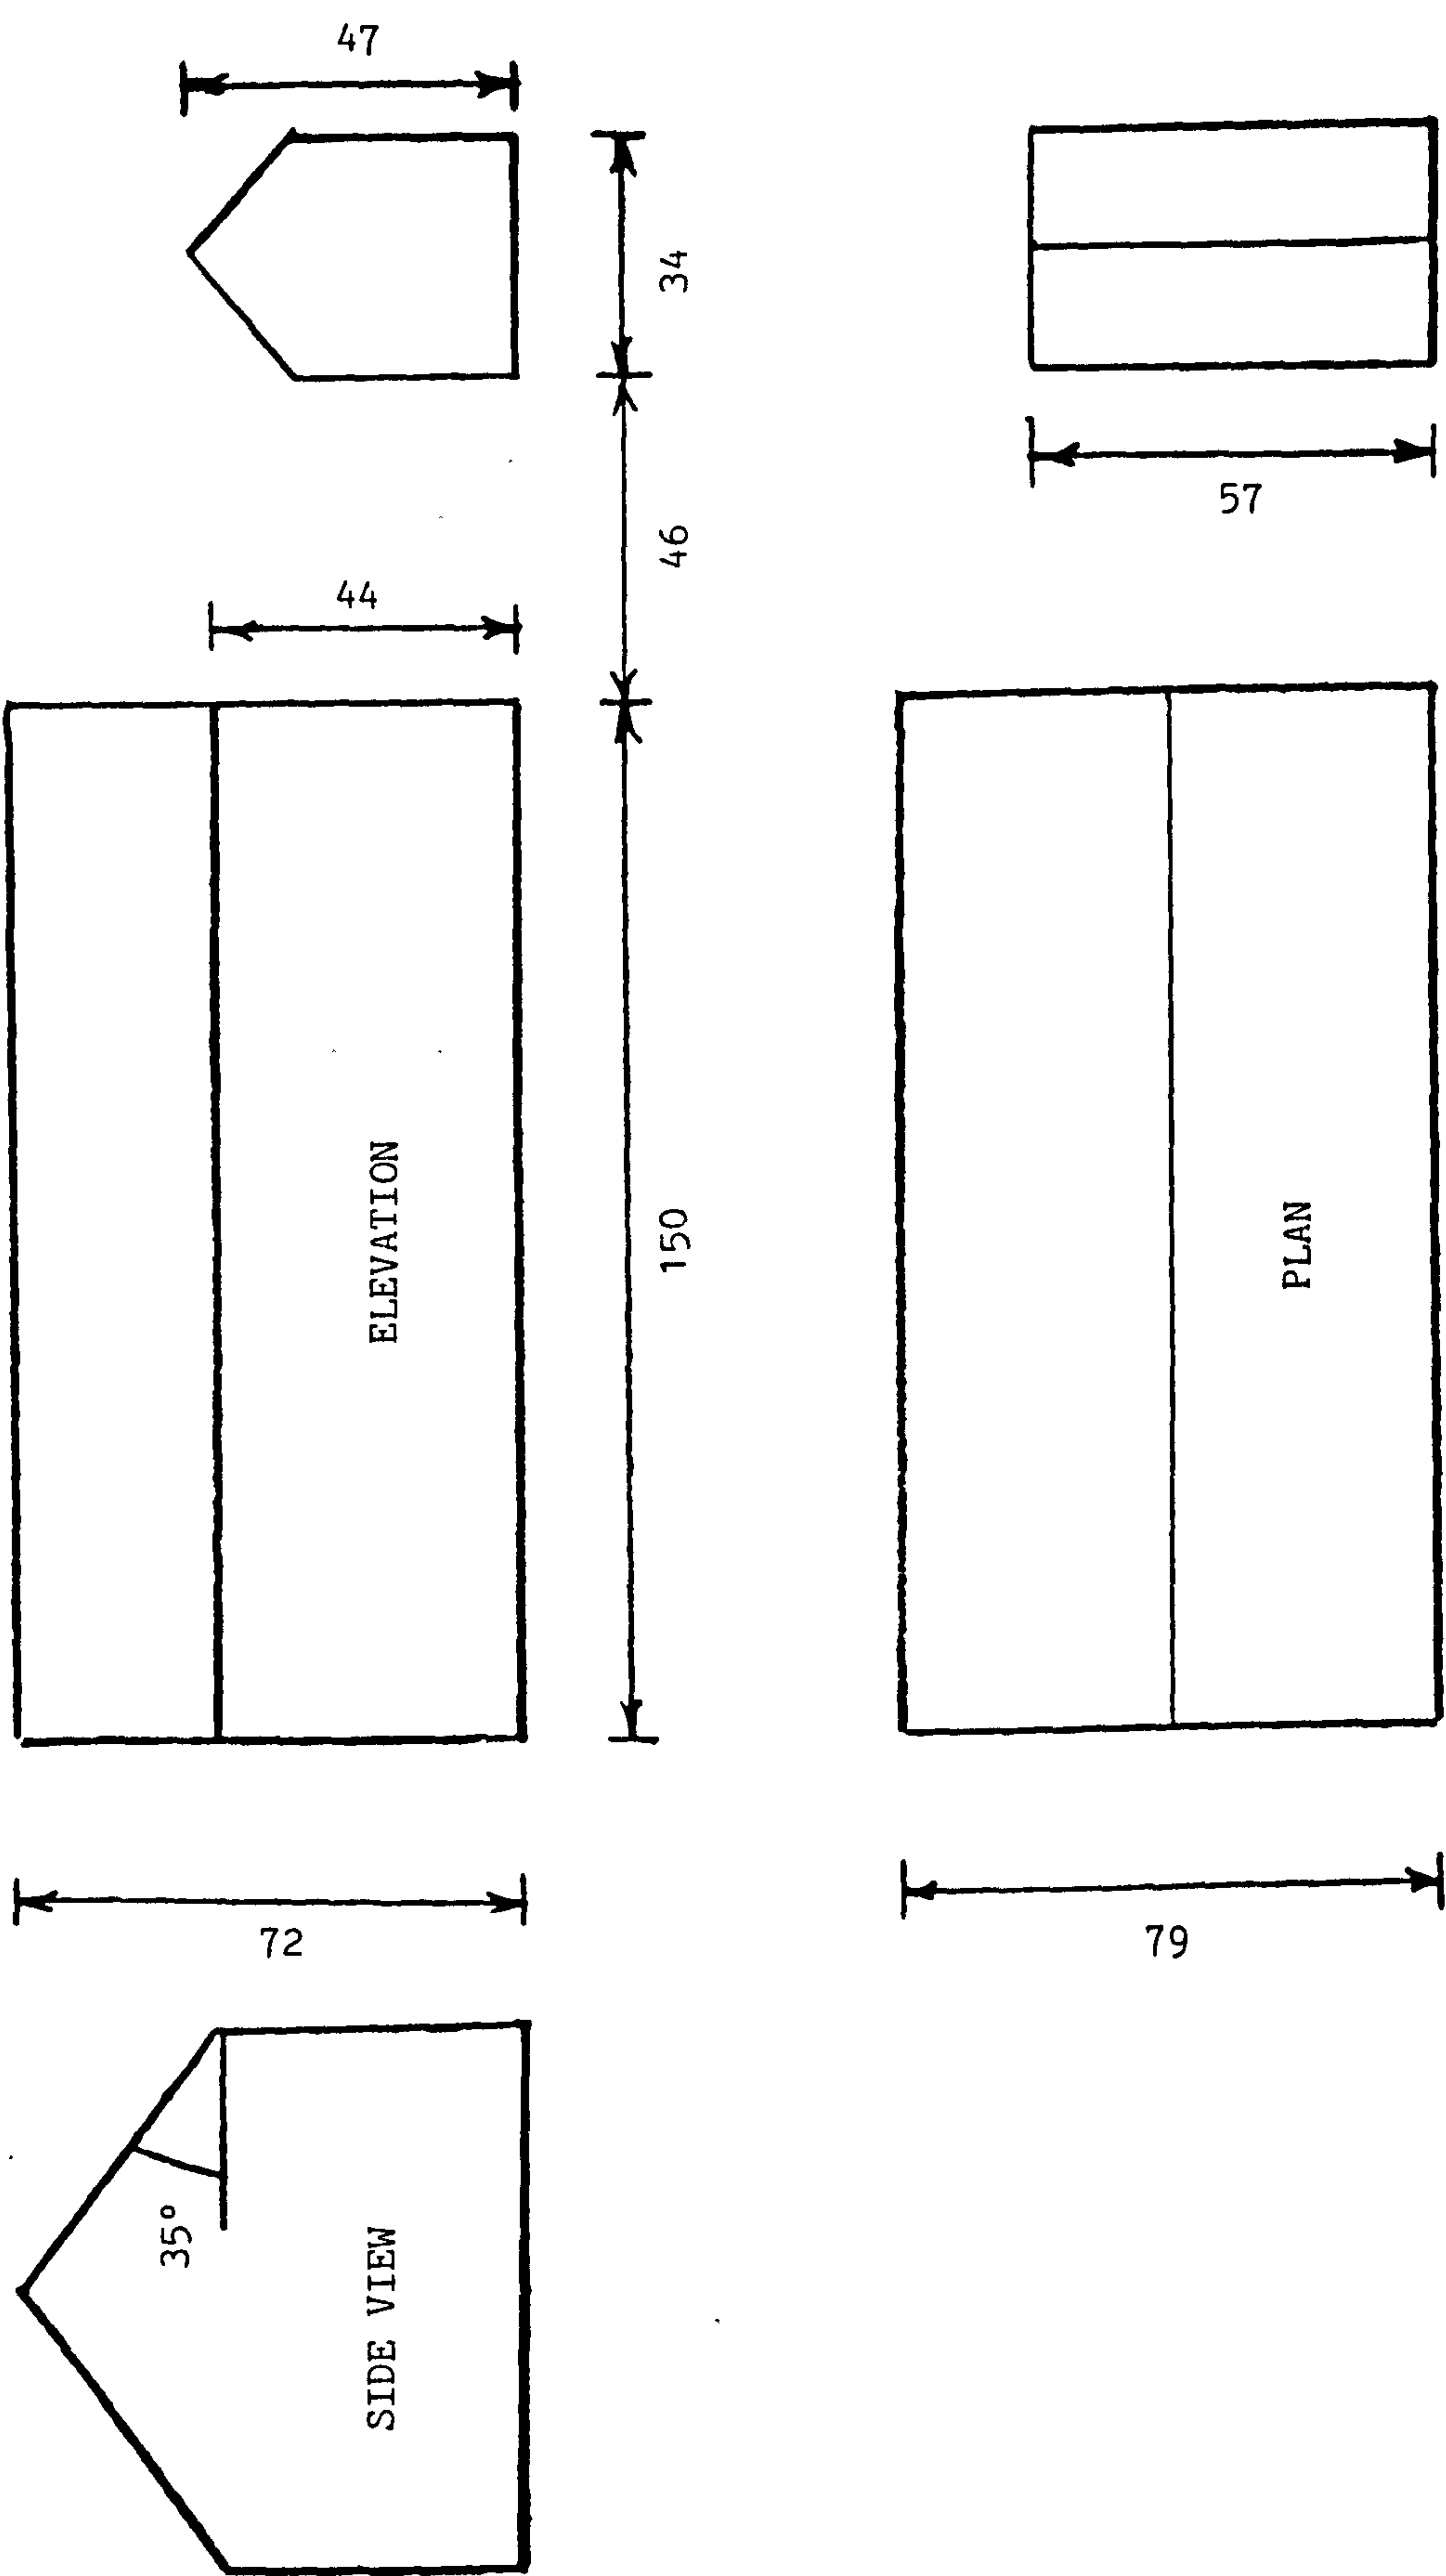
1:64 Scale model dimensions, all dimensions in mm
